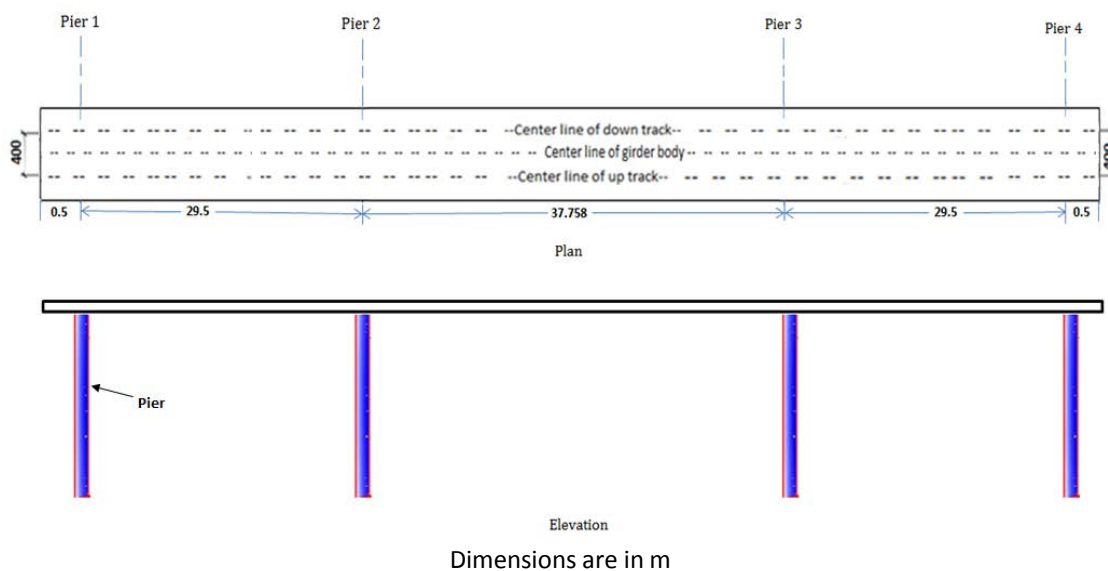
Typical Span and Elevation, 97.758m three-span continuous
